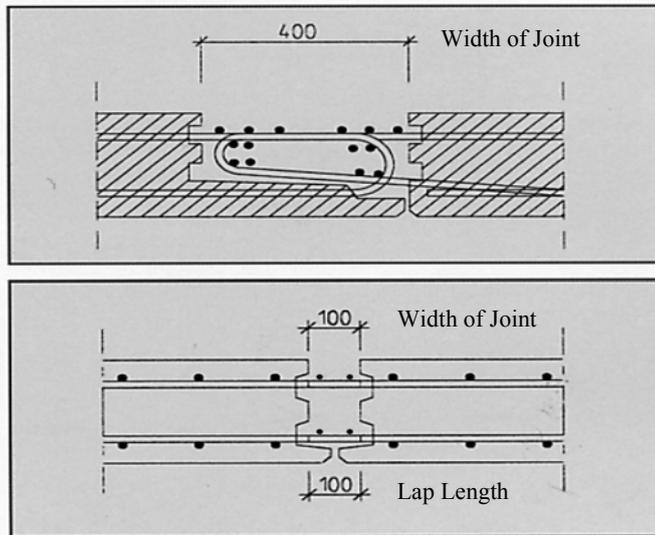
Comparison of joints between prefabricated deck slabs: a conventional joint (above) and the new joint (below).
